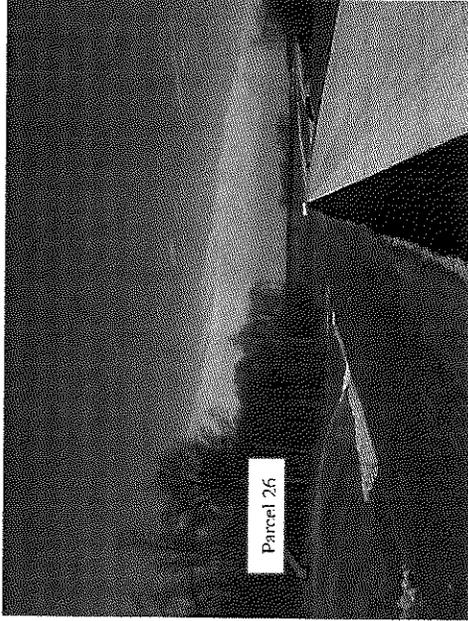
Standing on the shoulder of the newly constructed "Hoosier Heartland" facing northeast.
